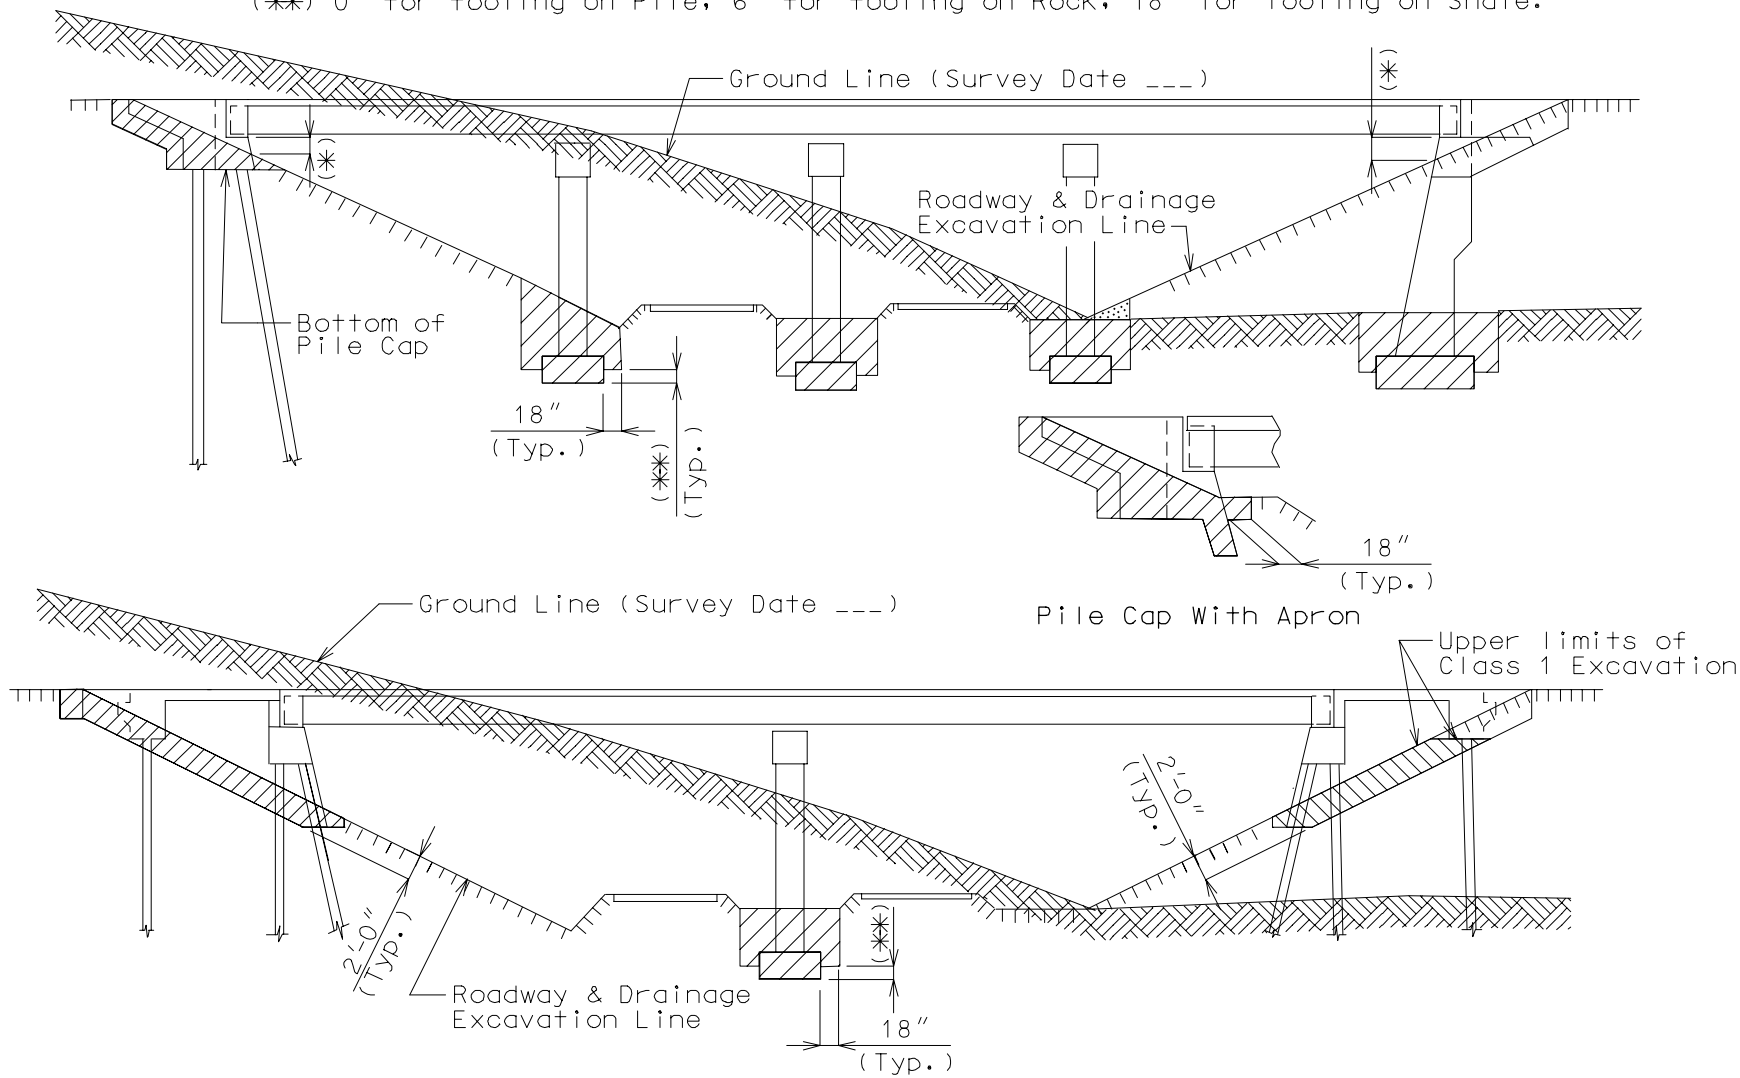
5 Excavation Limits: All Grade Separations
